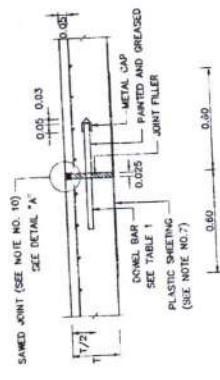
DETAIL OF SAWED JOINT FOR TRANSVERSE JOINT
